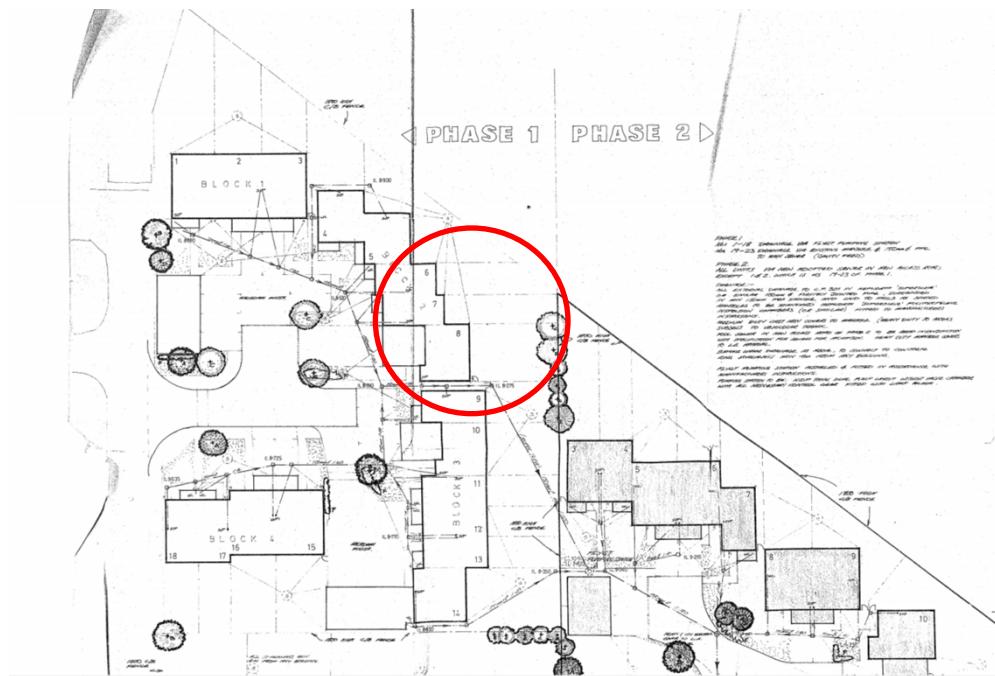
Extract of Landscaping Site Plan Drawing No. 1837-2-12 for application P/06562/002. The red circle identifies the location of the site, No. 20 St Michael's Court.
